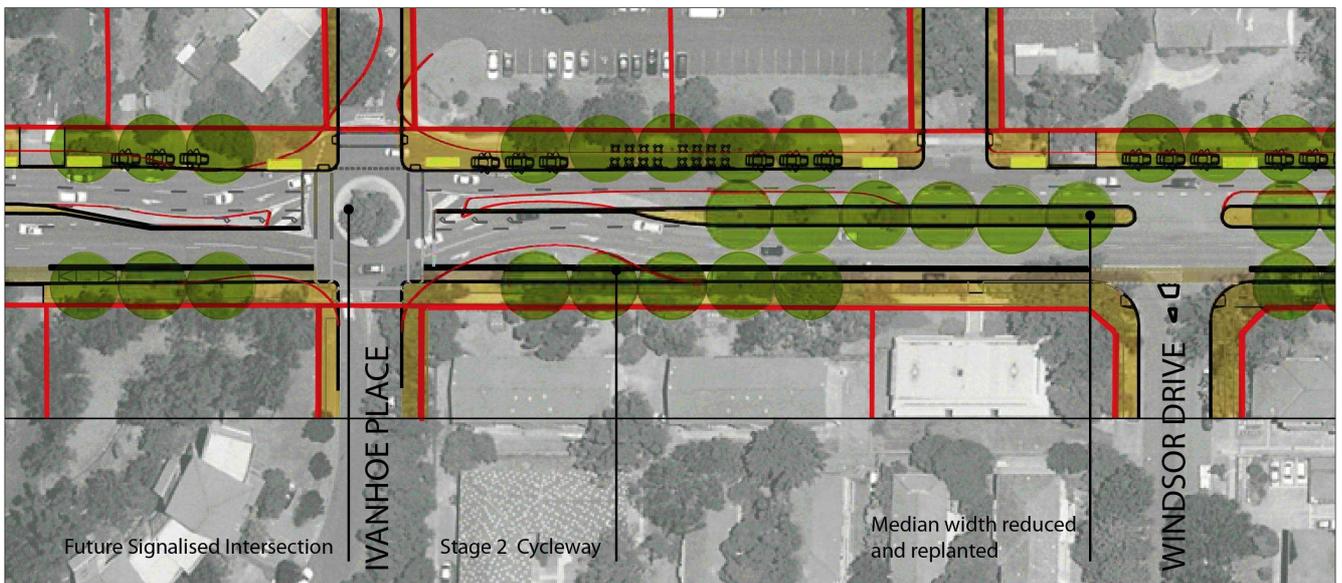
Detail of improvements between Ivanhoe Place and Windsor Drive
